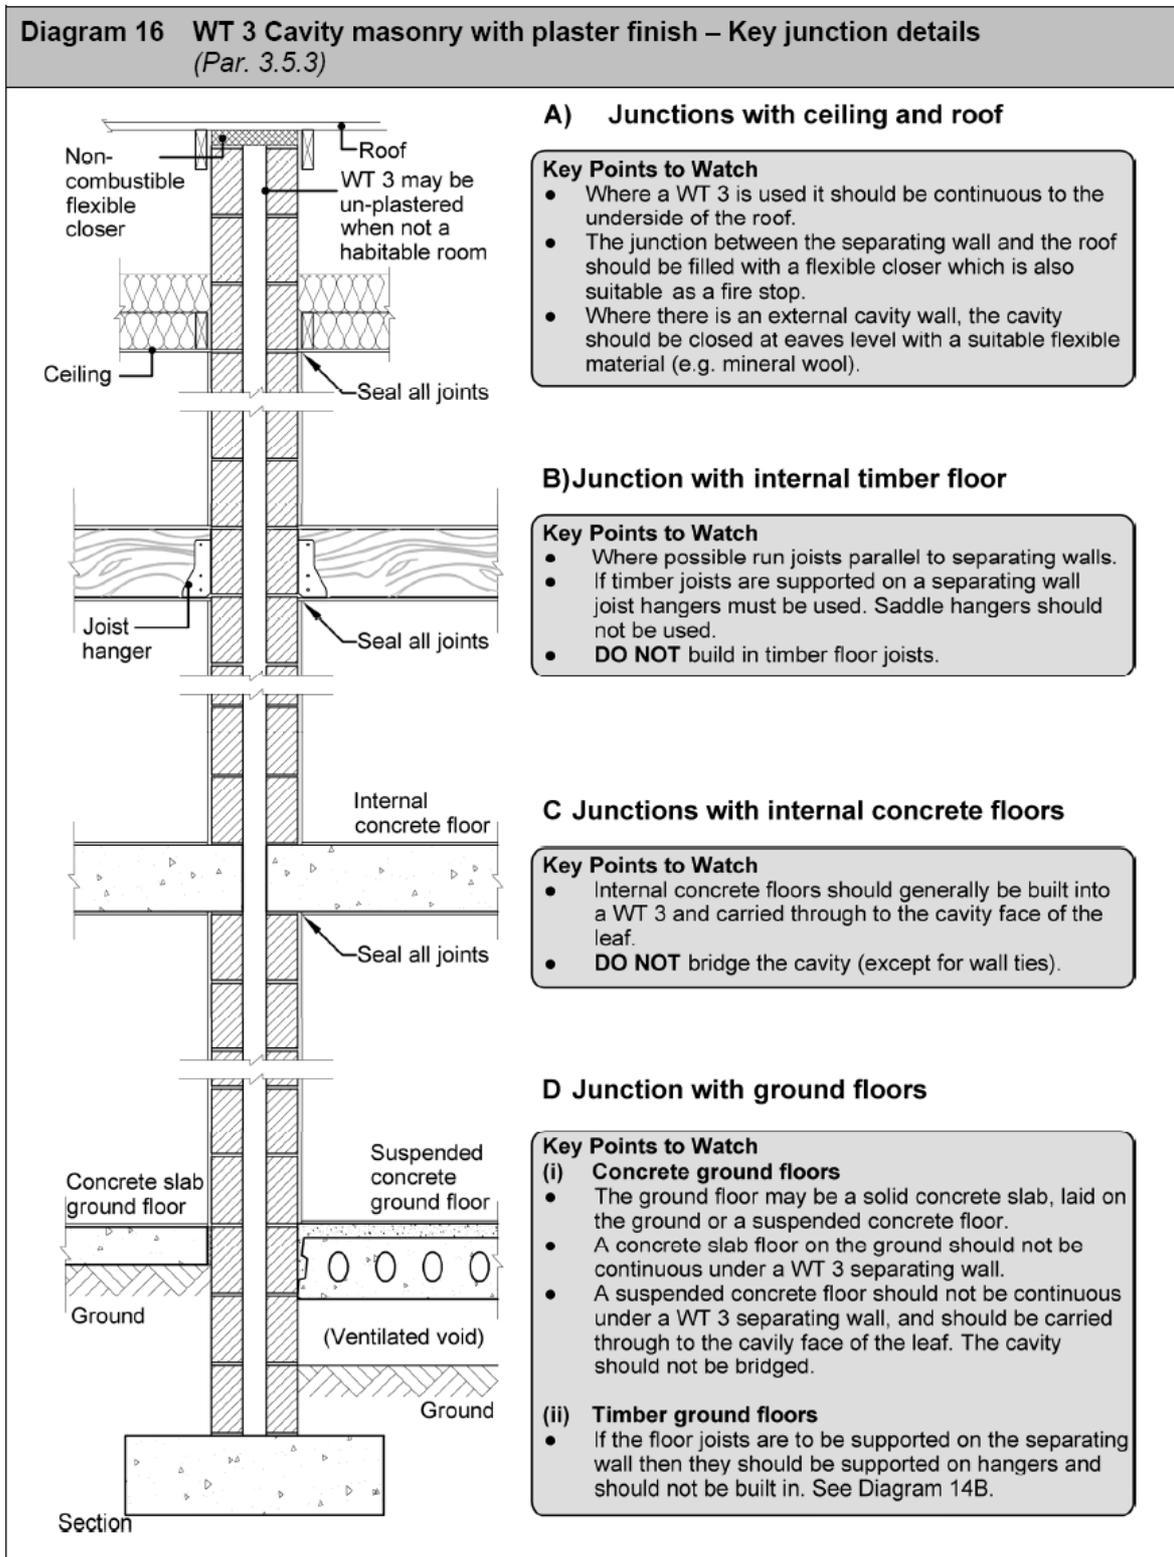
Diagram 16 from TGD, Part-E showing the key junction details when the separating wall is a cavity masonry wall.
